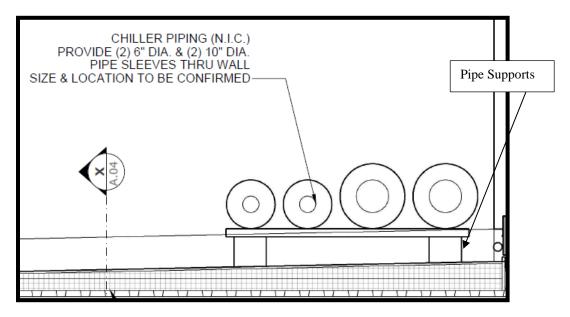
Pipe Supports Section View. (See A.07 Building/Wall Section)
